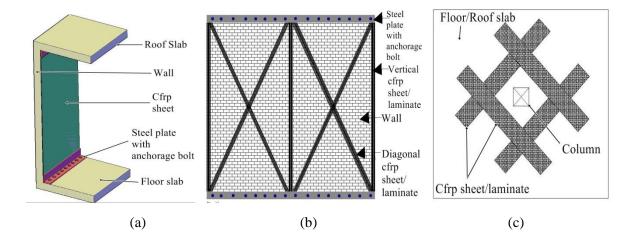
(a) Cfrp sheet application on wall, (b) Wall strengthen by two vertical and four diagonal cfrp sheet/laminates (Bischof, Suter, 2014), (c) Roof/Floor slab strengthen by four cfrp sheet/laminate in skewed formation offset from column (Soudki et al., 2012).
